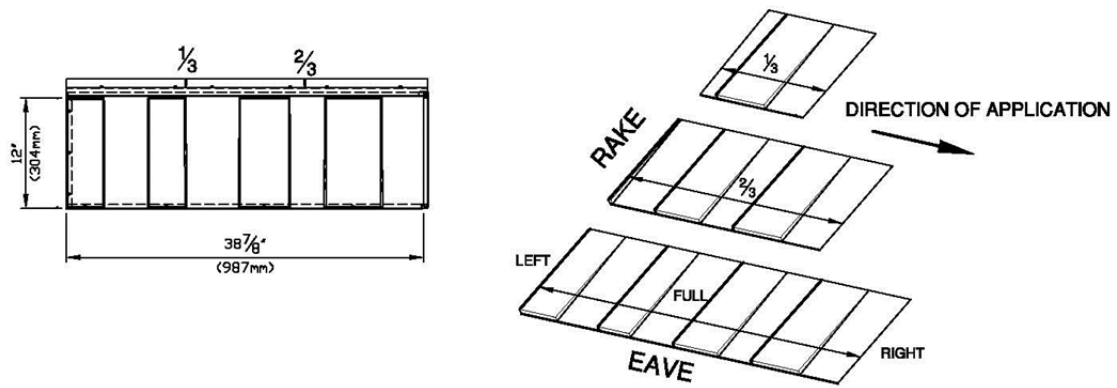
WAKEFIELD BRIDGE SHINGLE PROFILES
